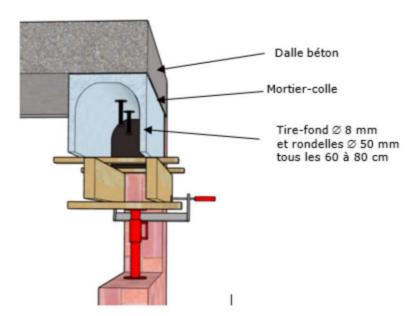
Installation under slab with lag bolts placed every 60 to 80 cm
